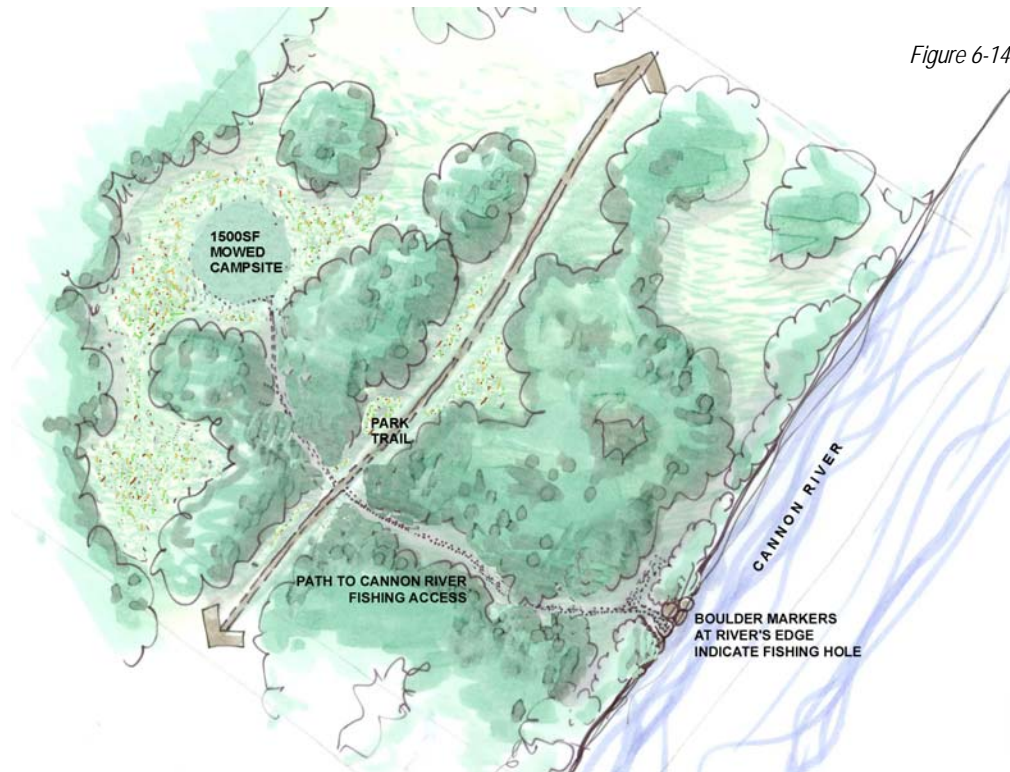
Typical walk in campsite and Cannon River fishing access
